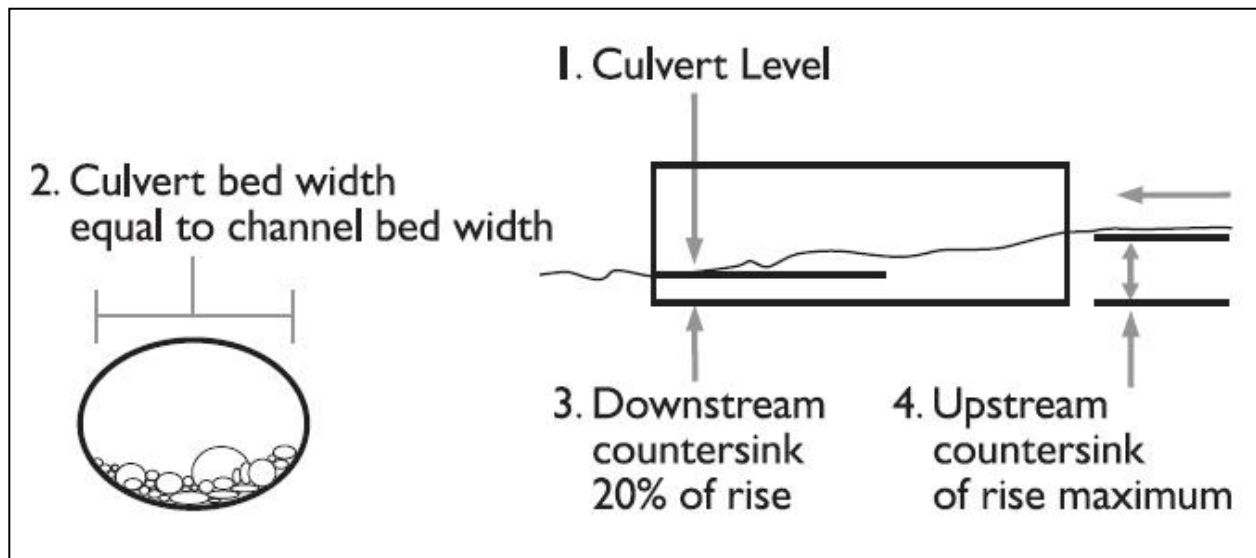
Profile and cross section for a typical no-slope culvert design (source: Bates et al. 2003).
